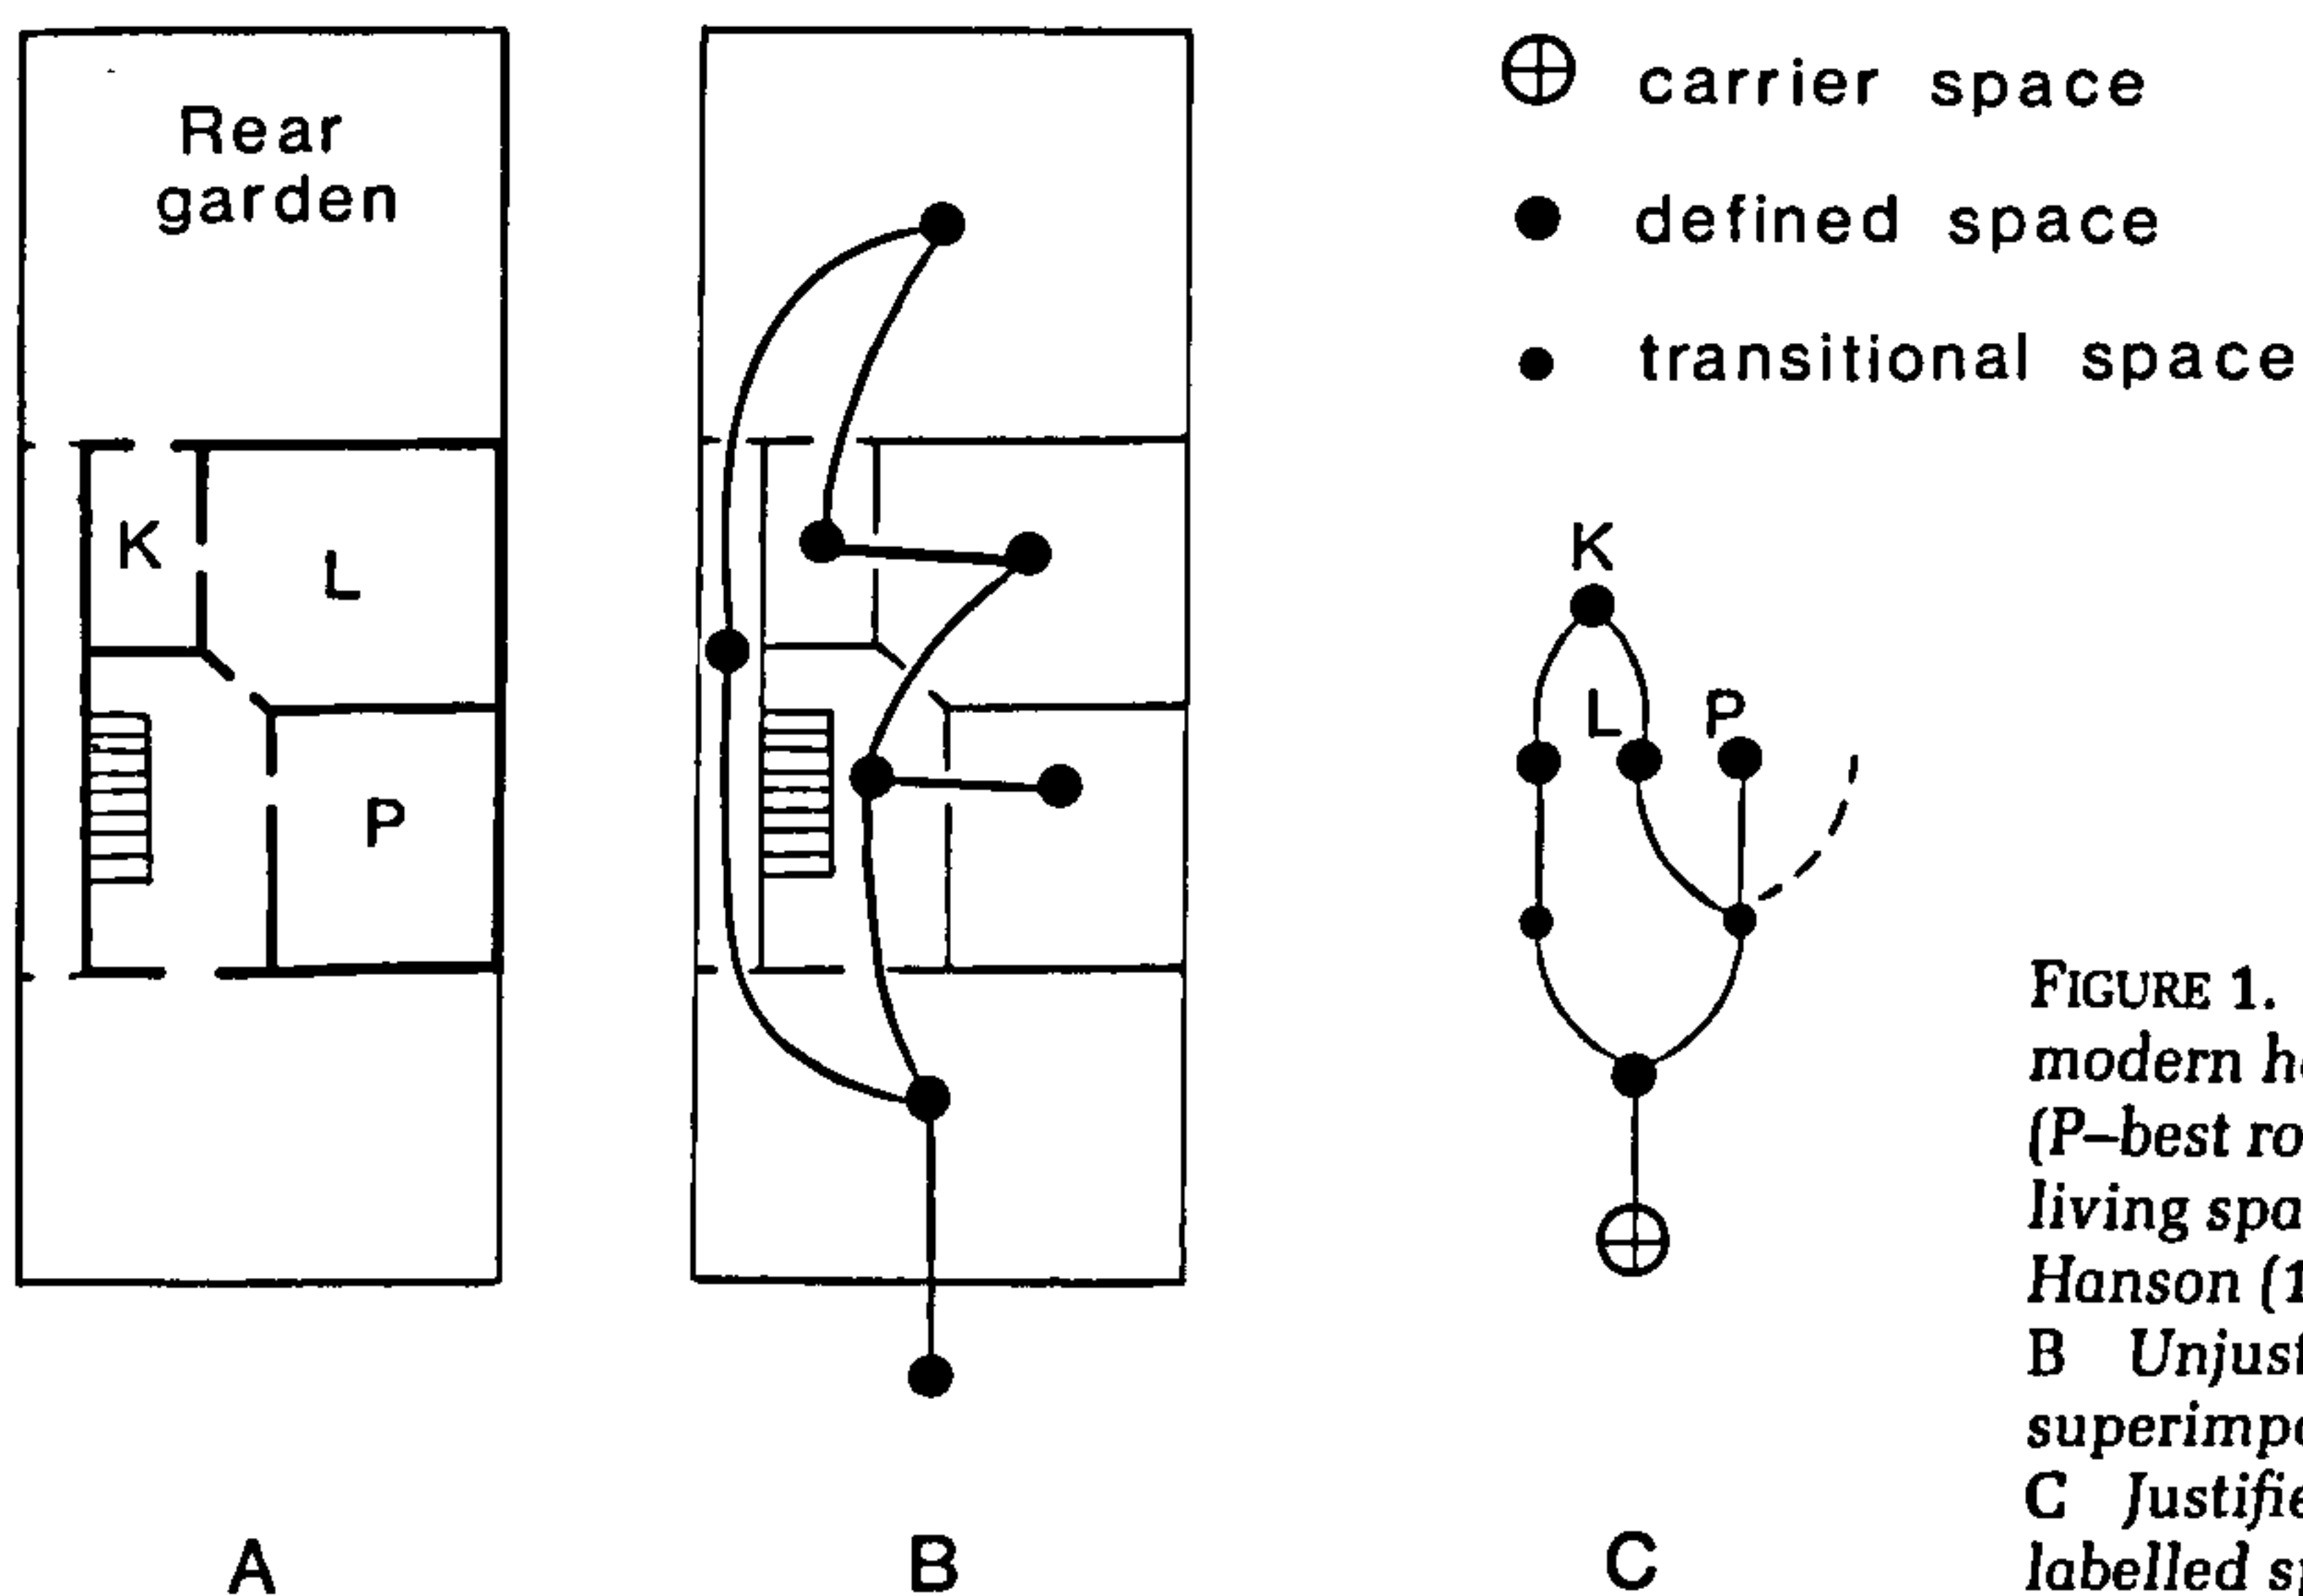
A Plan of a small modern house, ground floor only (P—best room, K—kitchen, L—main living space). (After Hillier & Hanson (1984): figure 99.)
